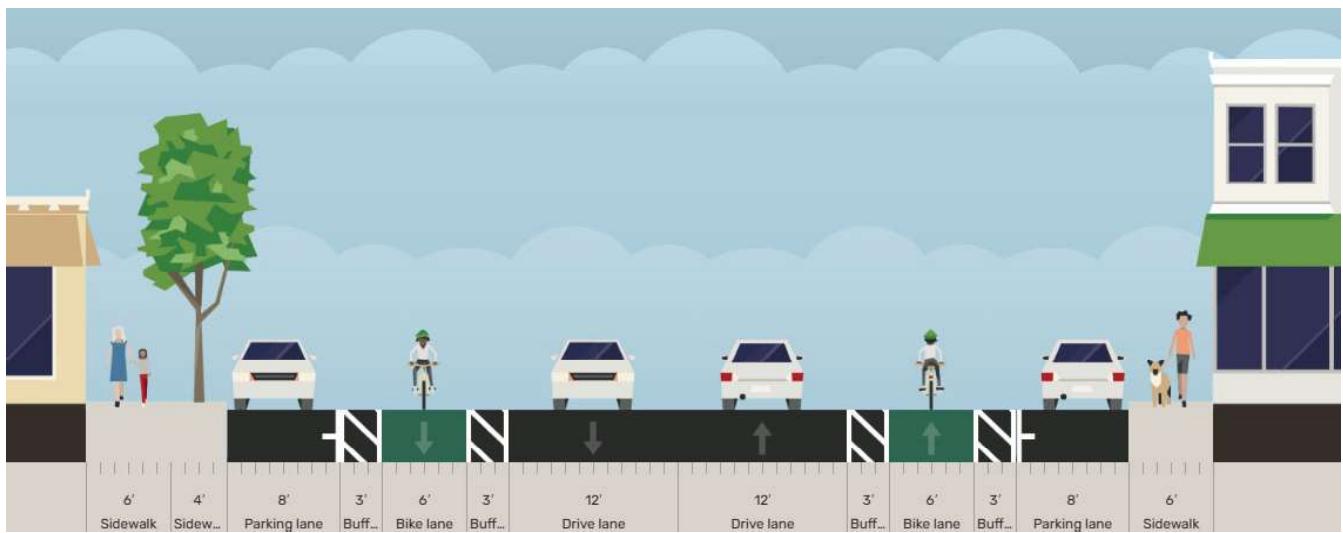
FERRY STREET OPTION 3 – BUFFERED BIKE LANES (INSIDE PARKING AREA)
